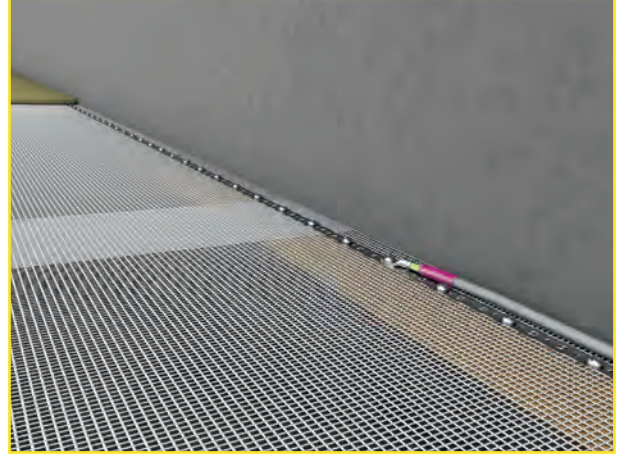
Electrical interconnecting of the individual sheets with one another and connection to the equipotential bonding (RKS+EEB).
